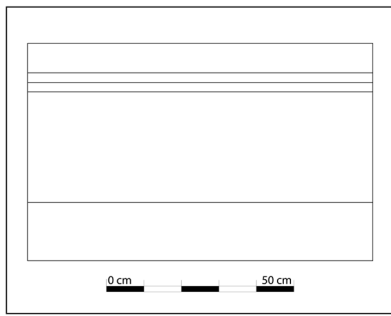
, b: The section and view drawings of the architrave block of the naos facade
